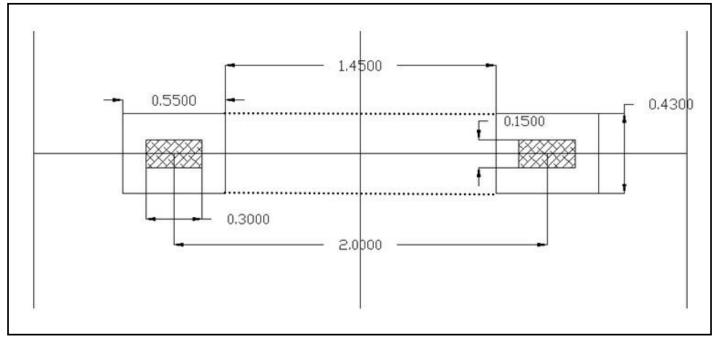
DUMMY LOAD REPRESENTATION FOR PSC BRIDGE SLAB
